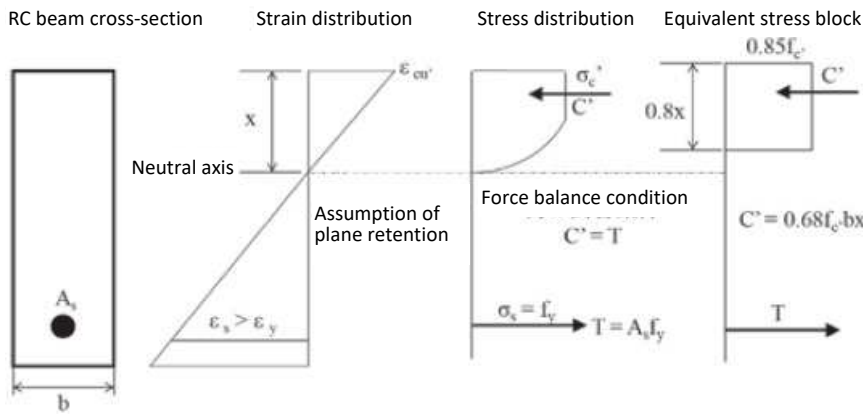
Conditions assumed when calculating the bending capacity of reinforced concrete beams
